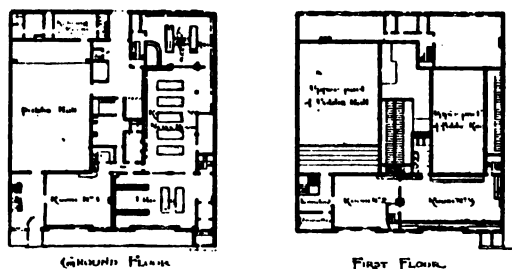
Plans of the Openshaw Branch Library, Manchester.
